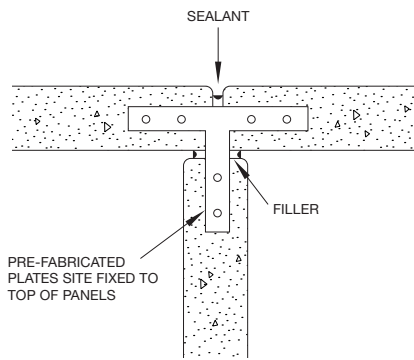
Plan View – Panel to Panel Top Corner T-Plate Restraint. (Plate bolted to cast-in ferrules to top reveal faces of panels)
